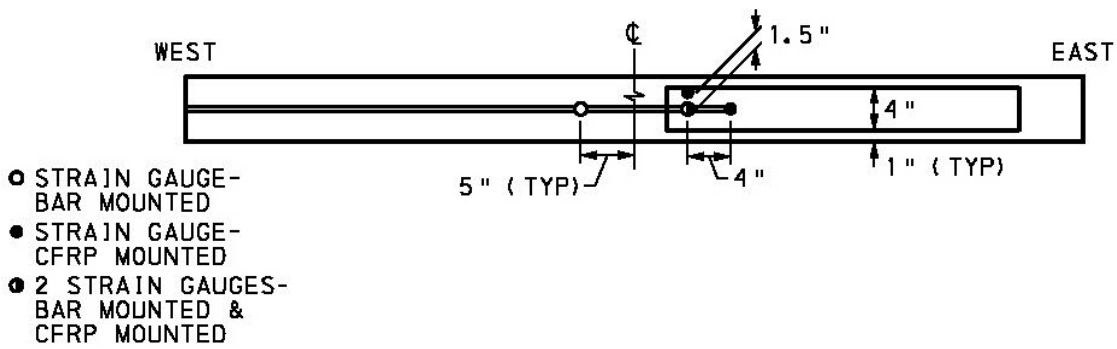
Beam S-18-B having contact CFRP-rebar splice.
